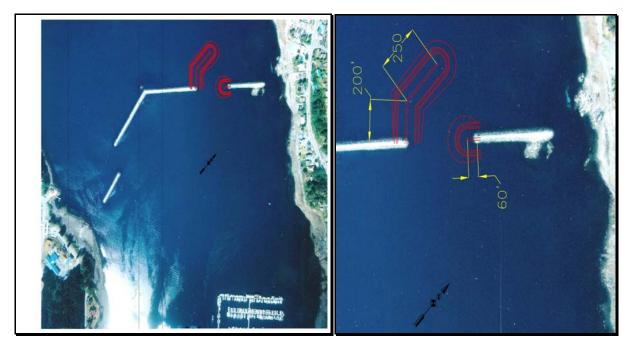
Alternative 15 would provide an angled extension to the main breakwater and a straight extension to the north breakwater, creating a 100 foot overlap – drawing not to scale.
